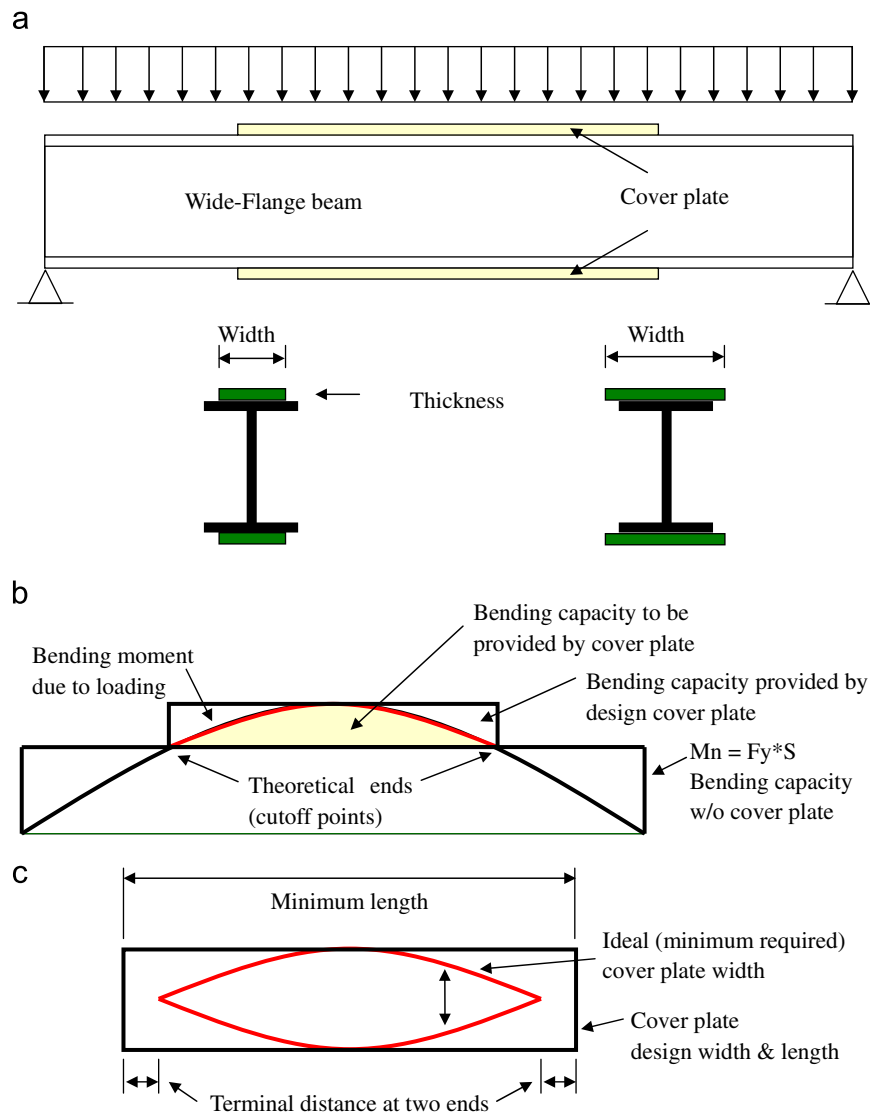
Cover plate reinforcement of typical flexural member in buildings and bridges. (a) Beam and cover plate, (b) bending moment and capacity, and (c) cover plate sizing.
